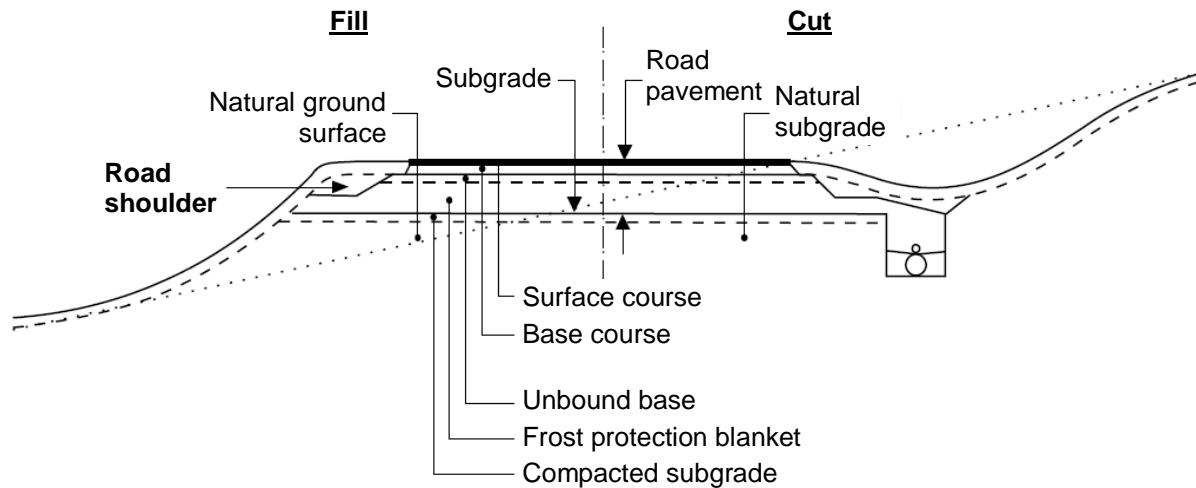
A typical cross-section of a highway pavement structure acc. to ZTV SoB-StB [98]
